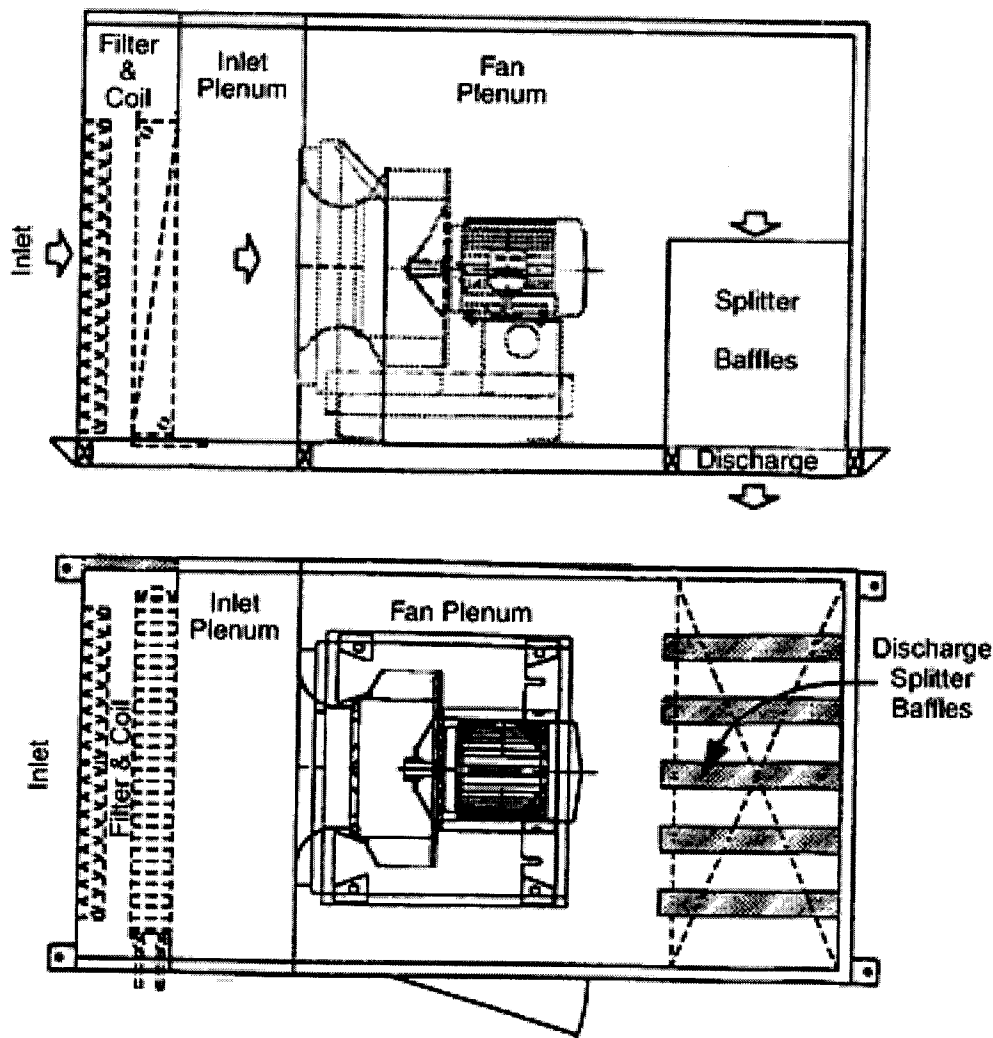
EXISTING AHU - SECTION (TOP) AND PLAN (BOTTOM)
